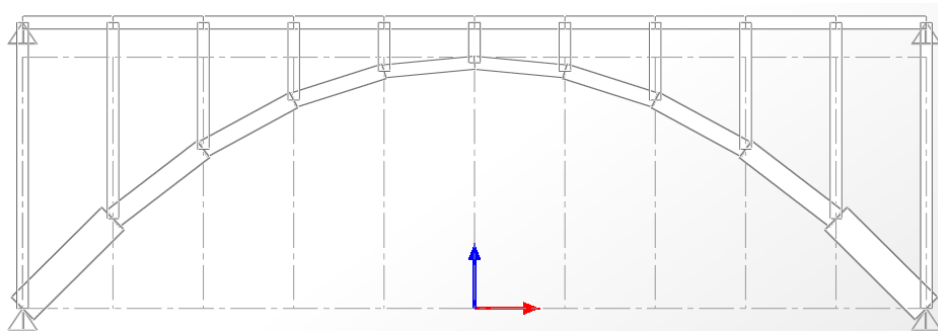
Elevation with spandrel columns 16" x 16" square.
